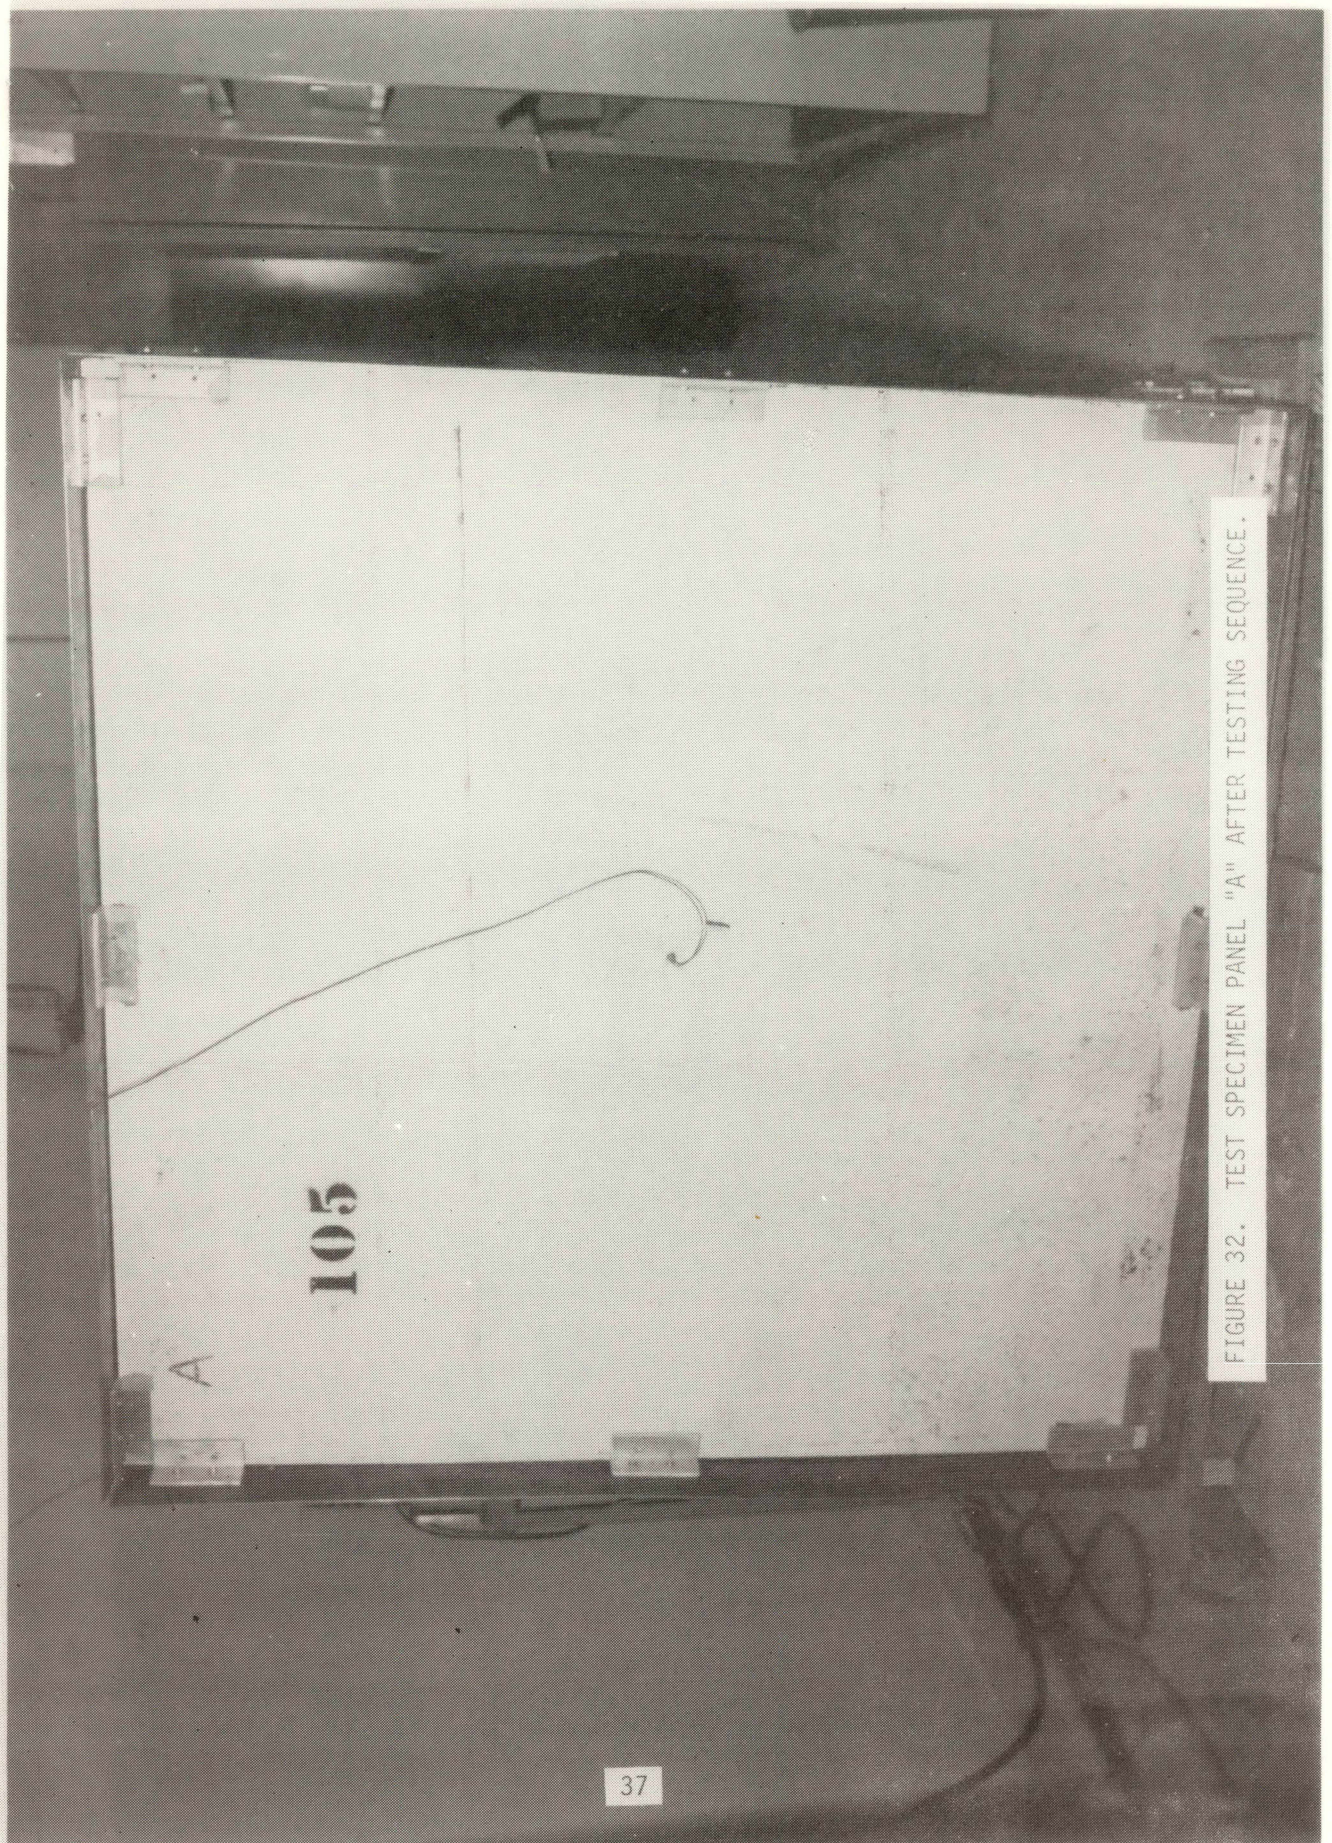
TEST SPECIMEN PANEL "A" AFTER TESTING SEQUENCE.
